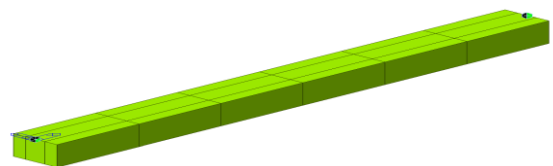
MIDAS model Beam with Concrete Jacketing and Maximum Reinforcement
